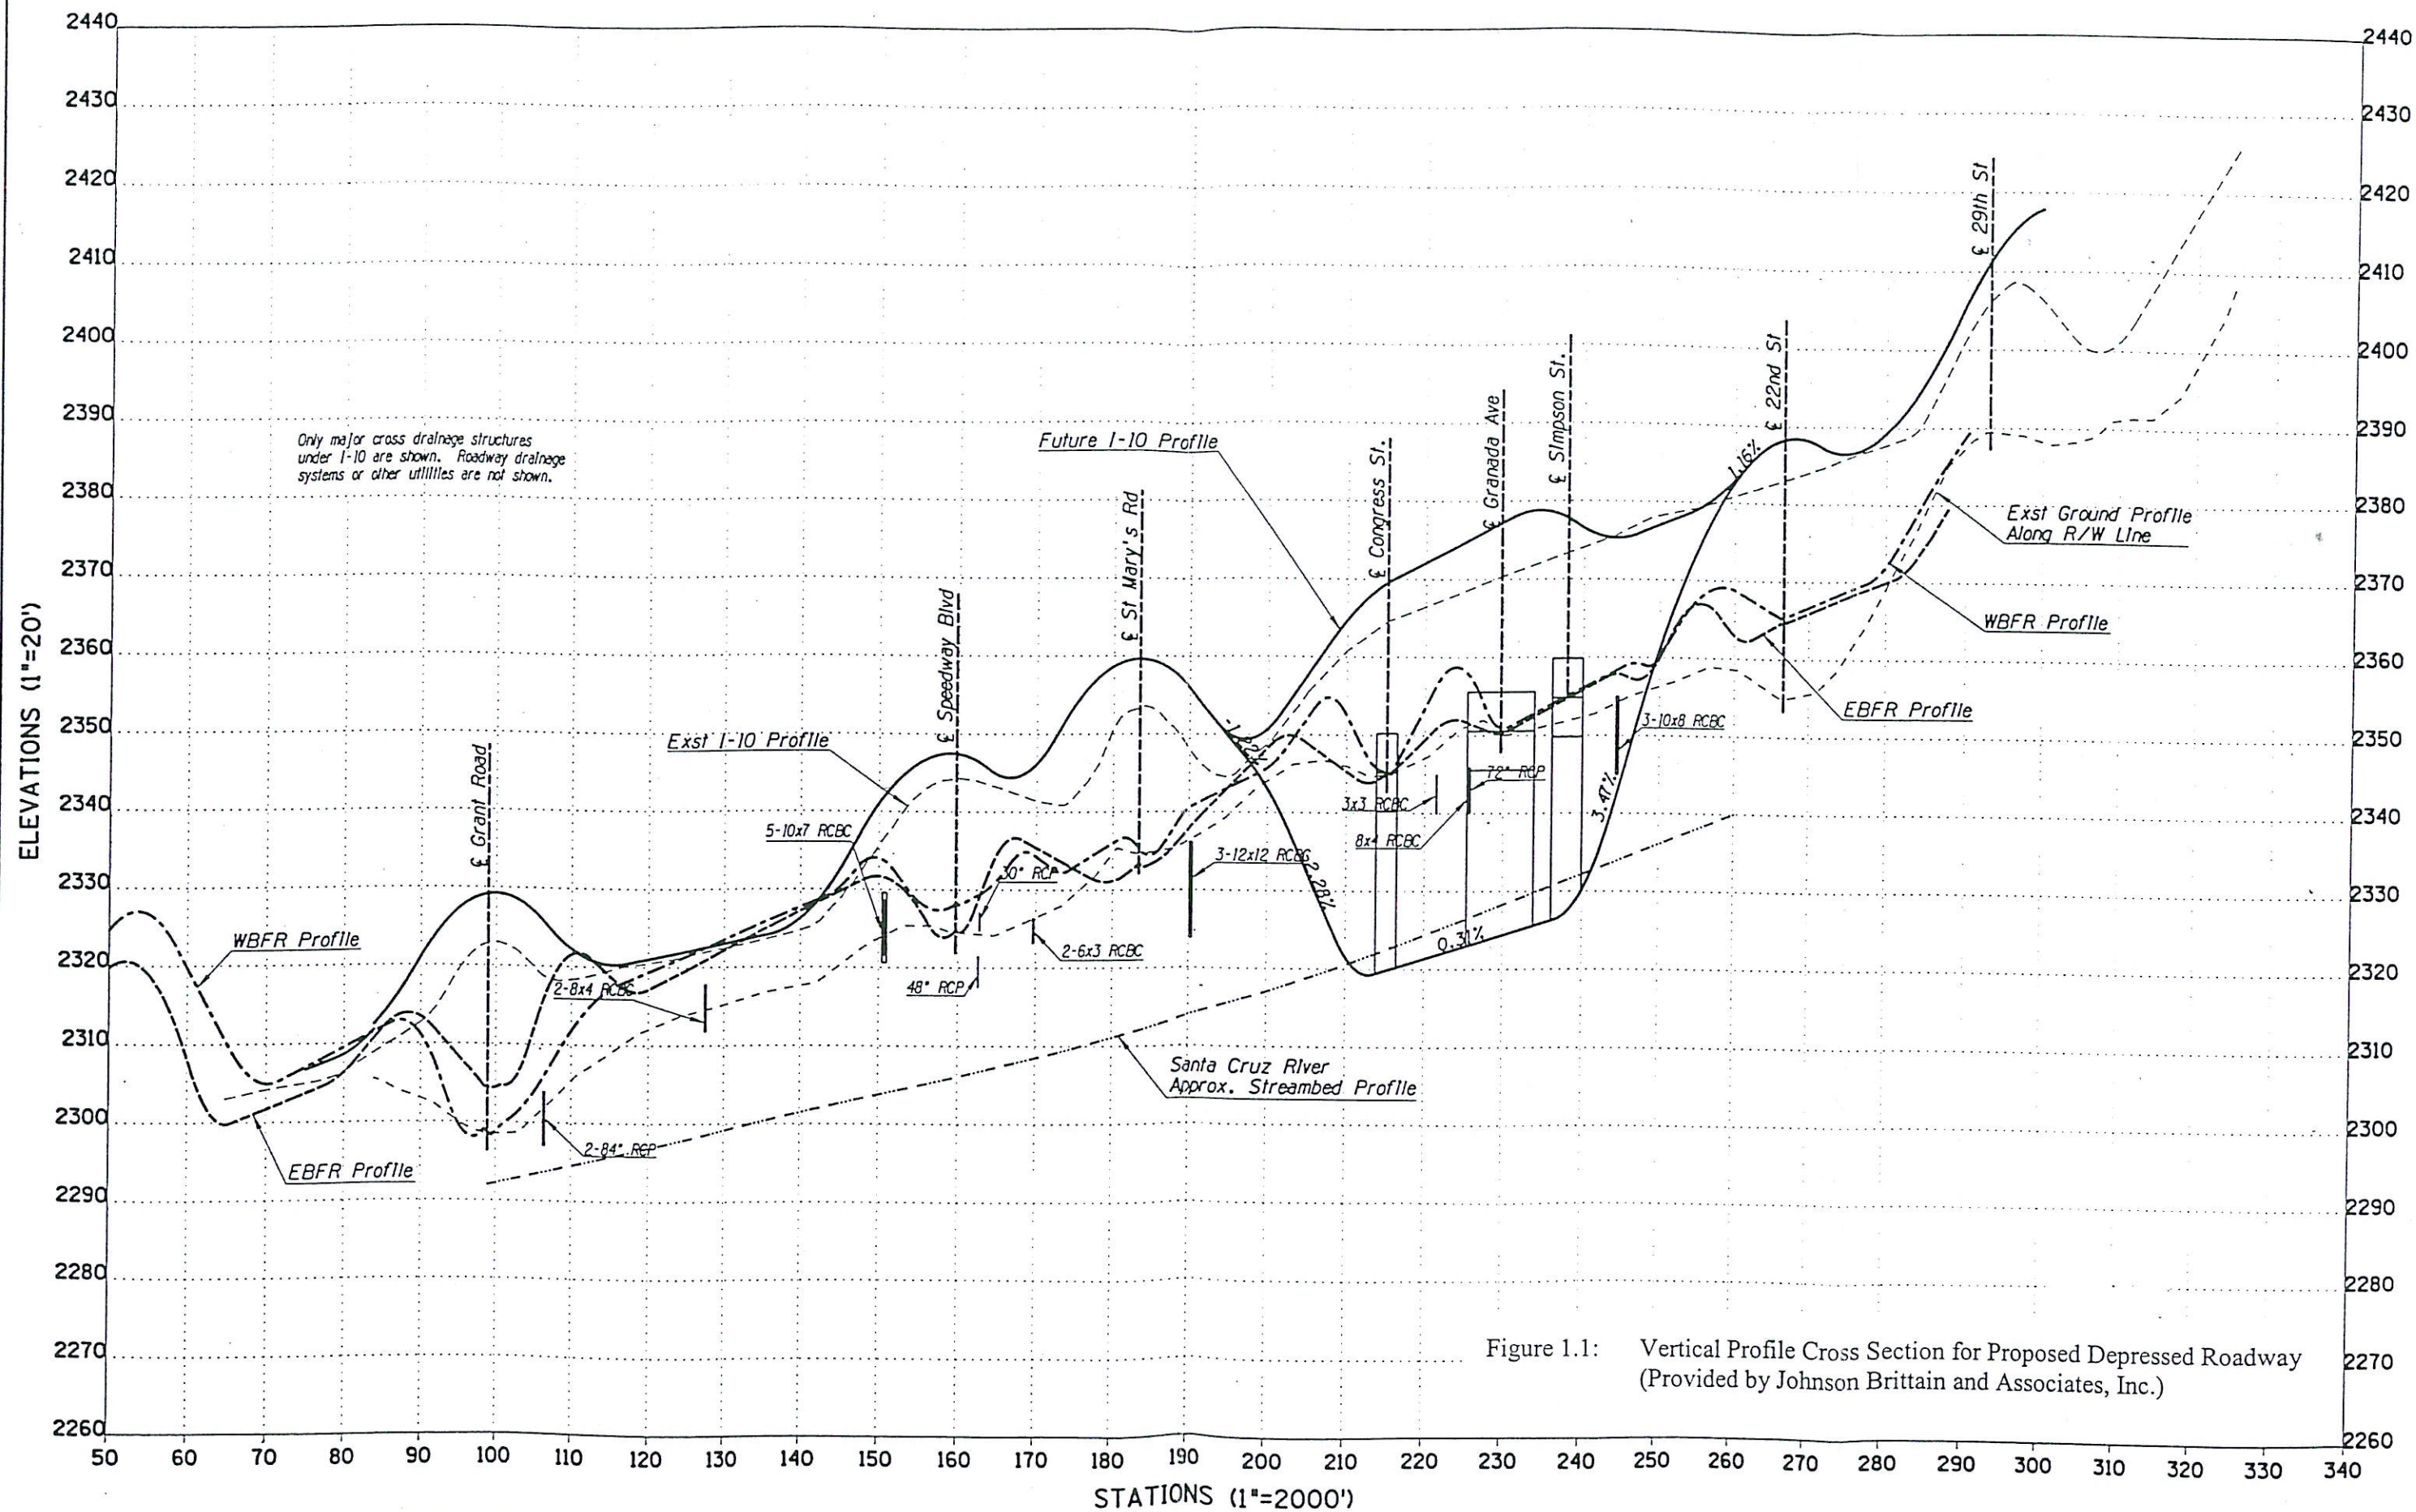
Vertical Profile Cross Section for Proposed Depressed Roadway
